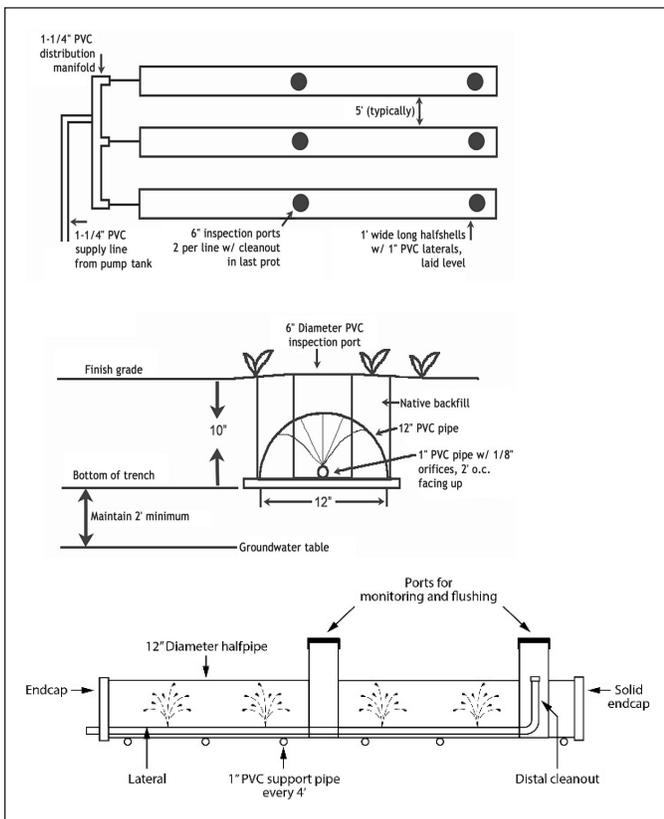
Shallow narrow trench detail: plan, cross section, and profile view
